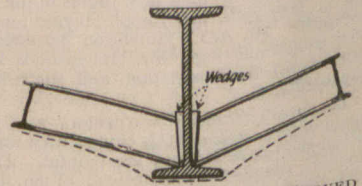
CONNECT ON OF CURVED I-BEAMS WITH FLOOR GIRDERS, MELAN CONCRETE AND IRON FLOOR CONSTRUCTION.
